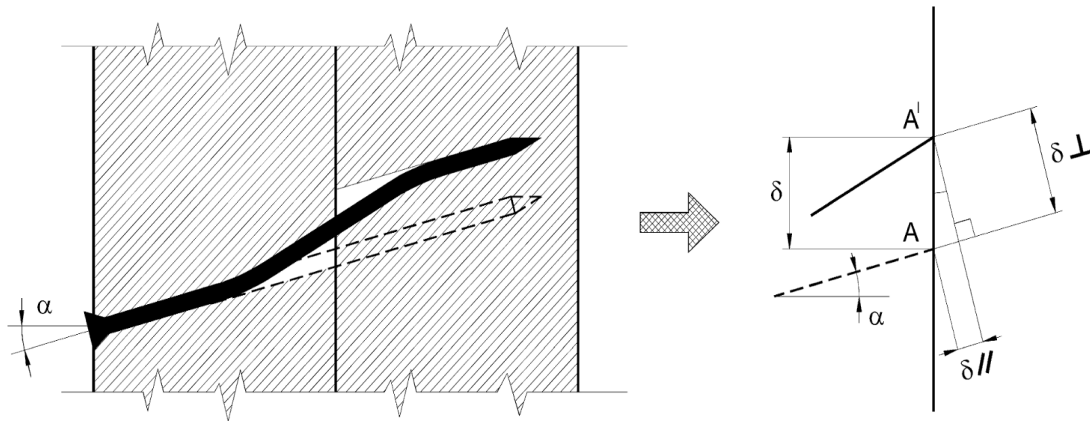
Geometrical decomposition of displacement on the shear plane [67, p. 1562].
